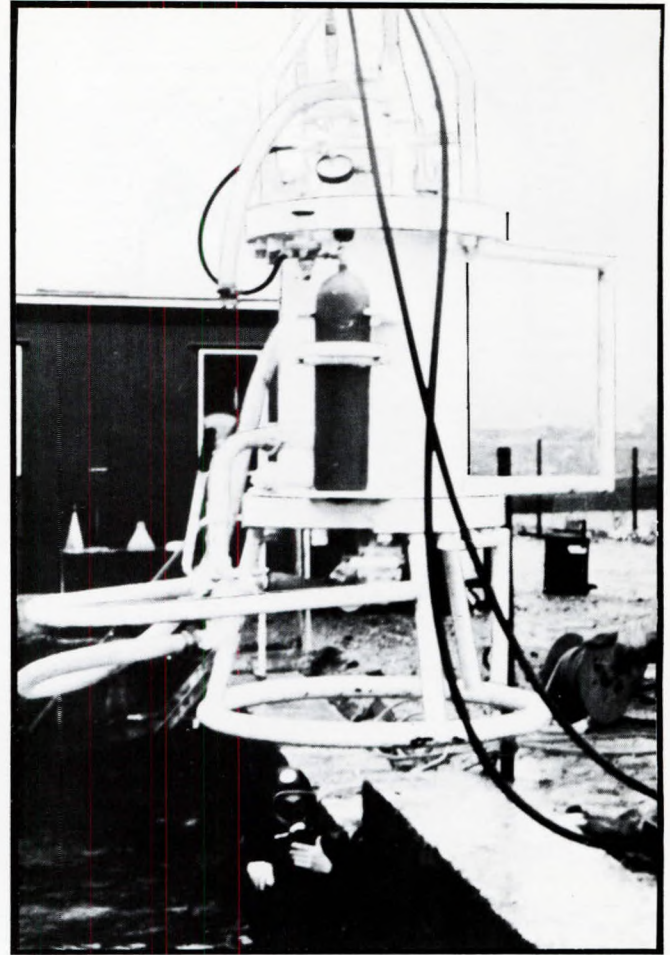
Grout injection module developed for underwater repair of concrete structures
